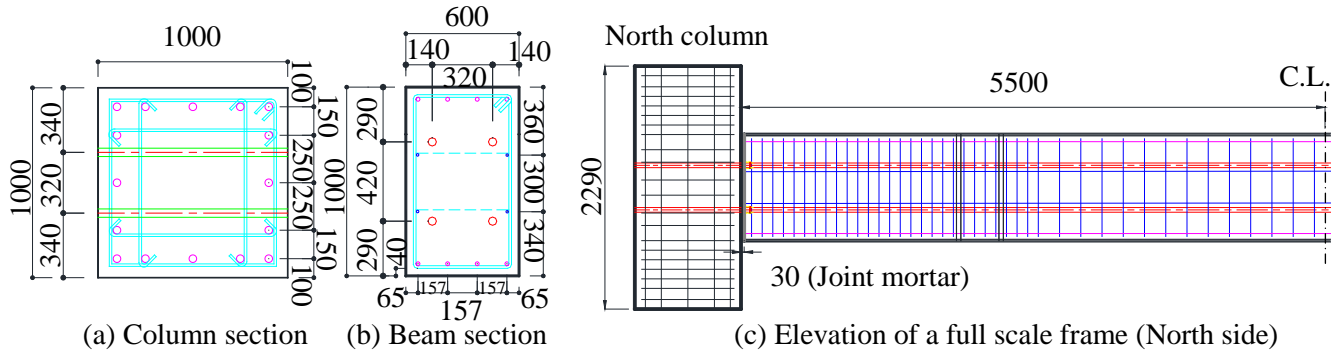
Reinforcement details and dimensions (Unit: mm)
